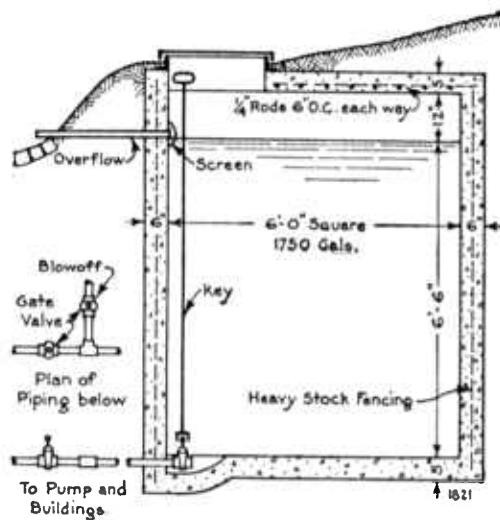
Working drawing for a square, reinforced concrete, underground tank. Very convenient when emptying and cleaning a tank, to have a valve on the supply pipe and a valve on a branch pipe or blow-off ending above ground and graded to drain the higher situated pipe and tank; closing the main valve and opening the branch valve empties the tank.
